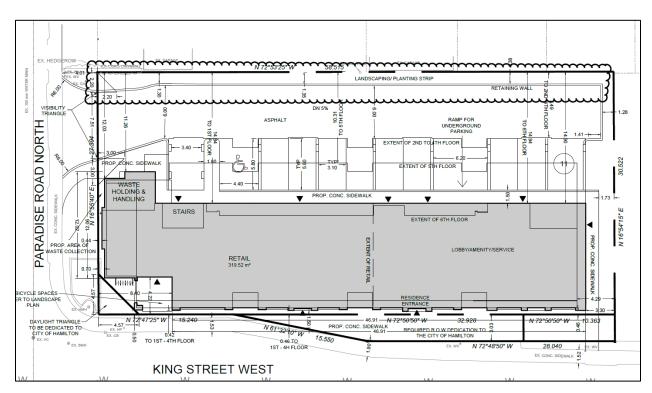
EXCERPT, CONDITIONALLY APPROVED SITE PLAN (NOV. 2021)
